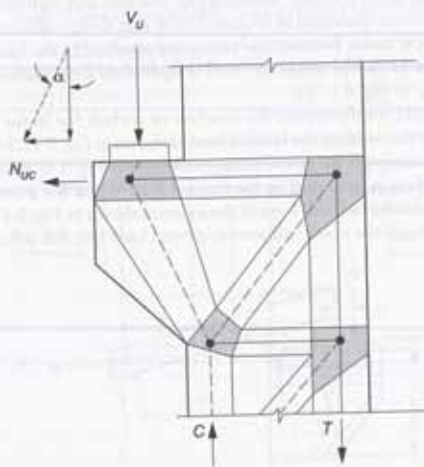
Strut-and-tie model for a typical reinforced concrete corbel.
